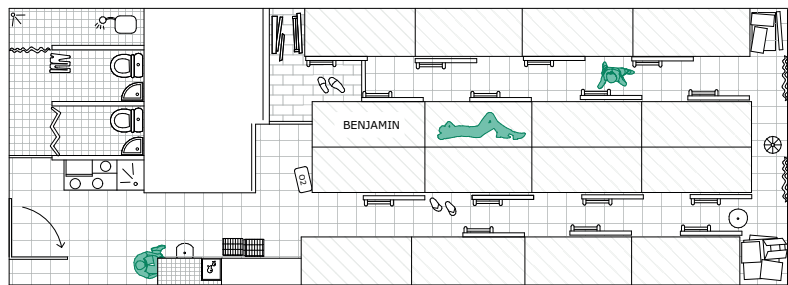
Floor plan „coffin“ apartment based on Suming, 2025
